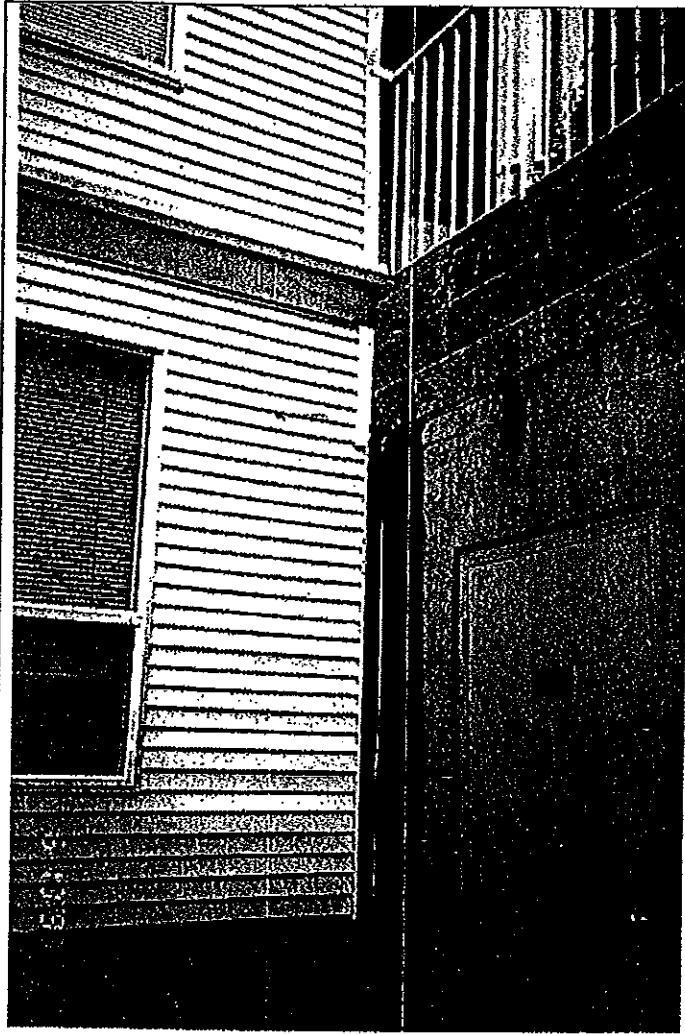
Typical step in the foundation. MH understands remedial work had been performed at this location to address water ingress.
